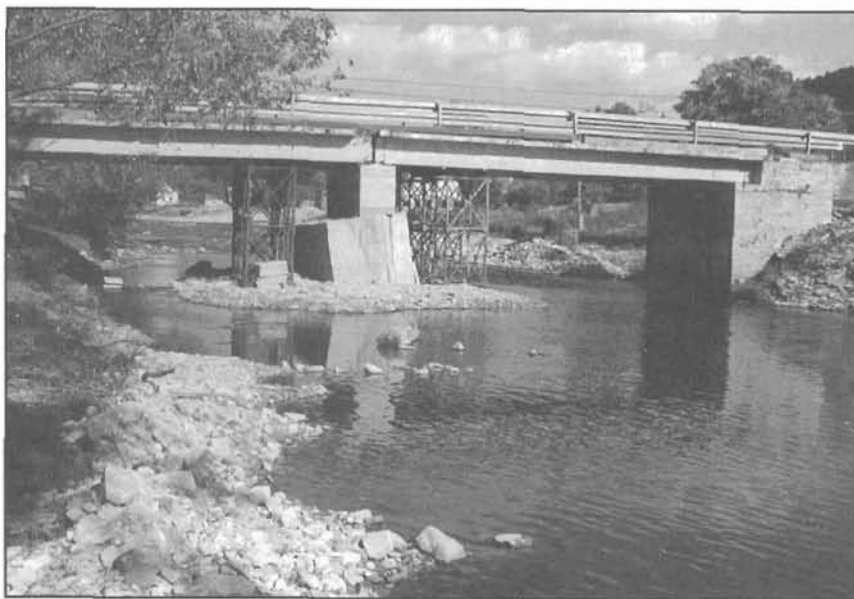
Lifted spans after the bridge broke due to undermining of its pillar. Note the significant settlement (approximately 1 meter) of the pillar and its dislocation (Radochów town - Baila Ladecka River).
